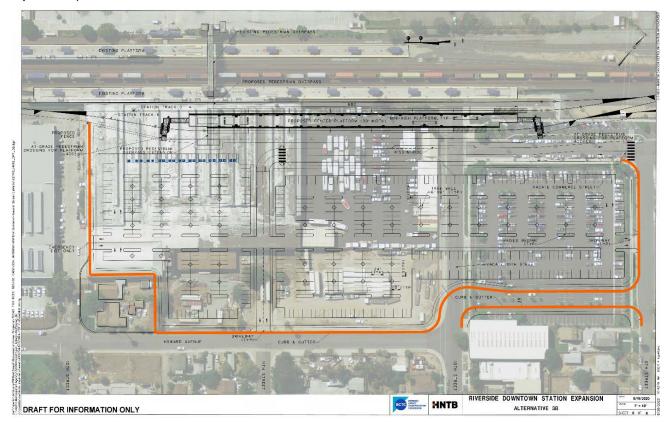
Build Alternative with Traffic Circulation and Parking Option 3B
